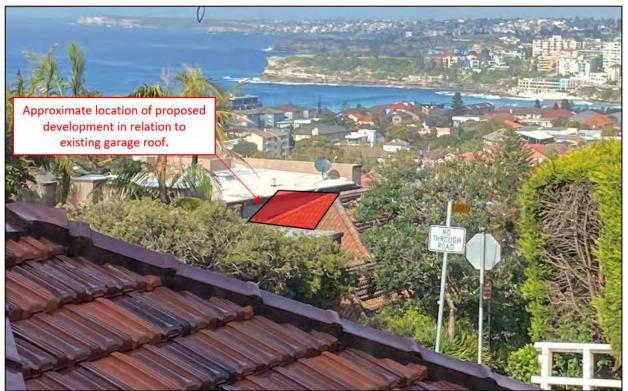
Approximate location of proposed development in relation to existing garage on subject site as viewed from the front setback area of 45 Military Road (zoomed in, looking south).
